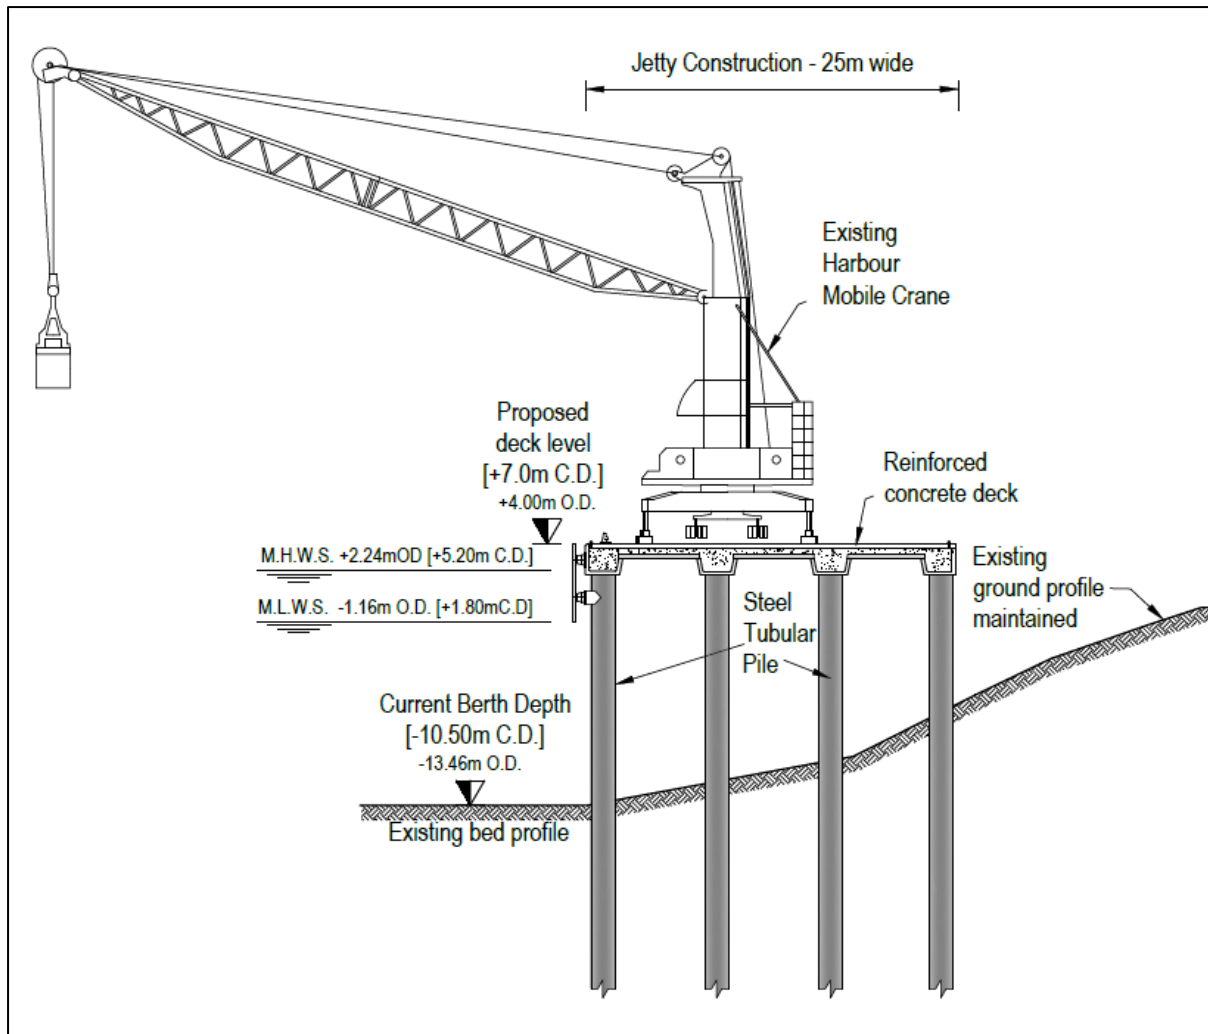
Typical Cross Section through Proposed Jetty Extension
